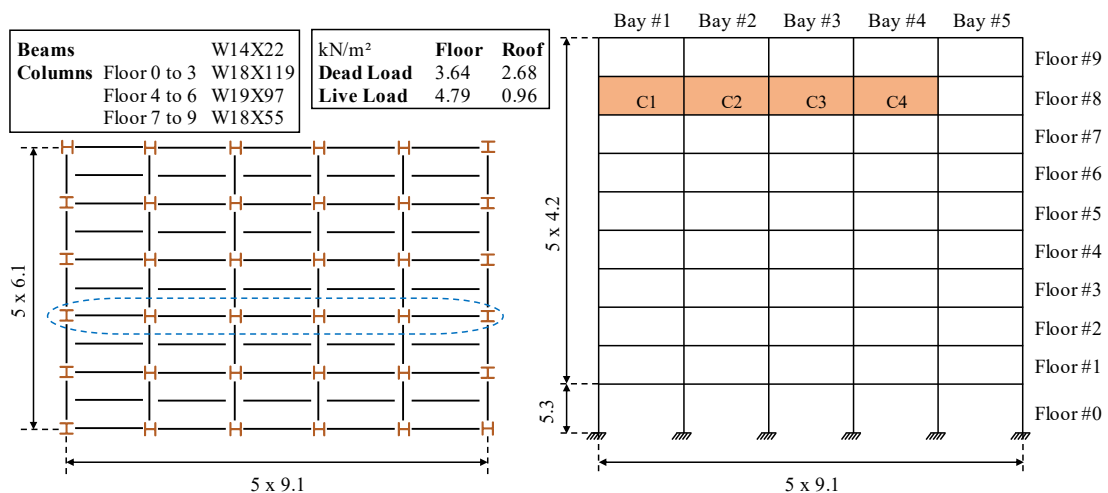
Plan layout, elevation, sections and loads. Dimension units are in meters
